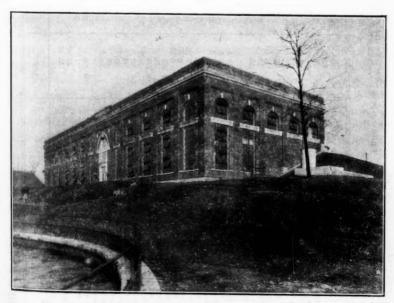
View of New Gravity Filtration Plant, Atlanta, Ga.
